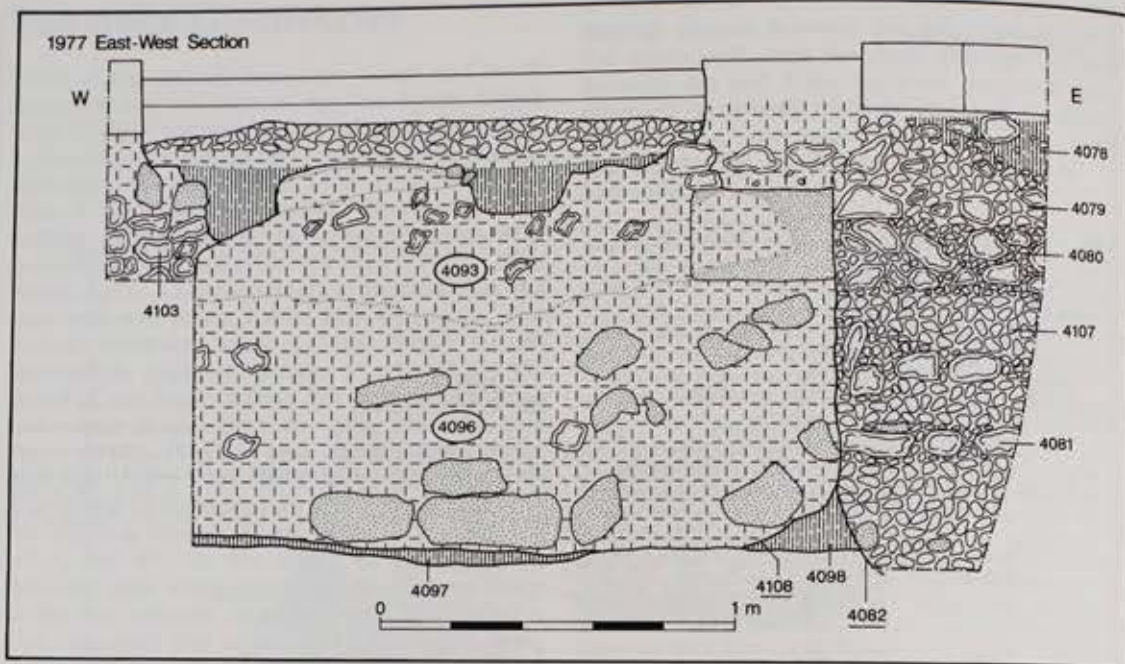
RA 1977: Section of footing (4093 and 4096) of Saxon south transept. See Fig 36 for location of sections.
